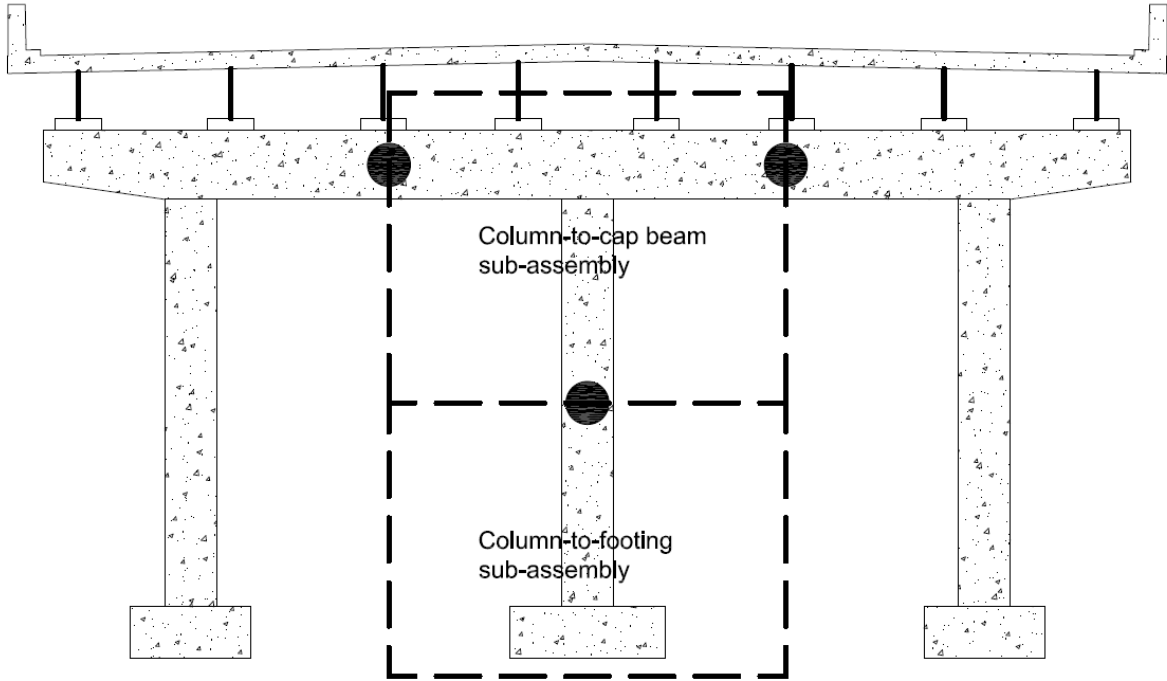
Prototype bridge with highlighted portions representing specimen design.
